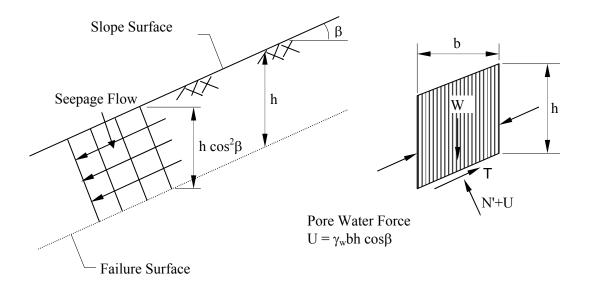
Infinite slope failure in a c- ϕ soil with parallel seepage.
